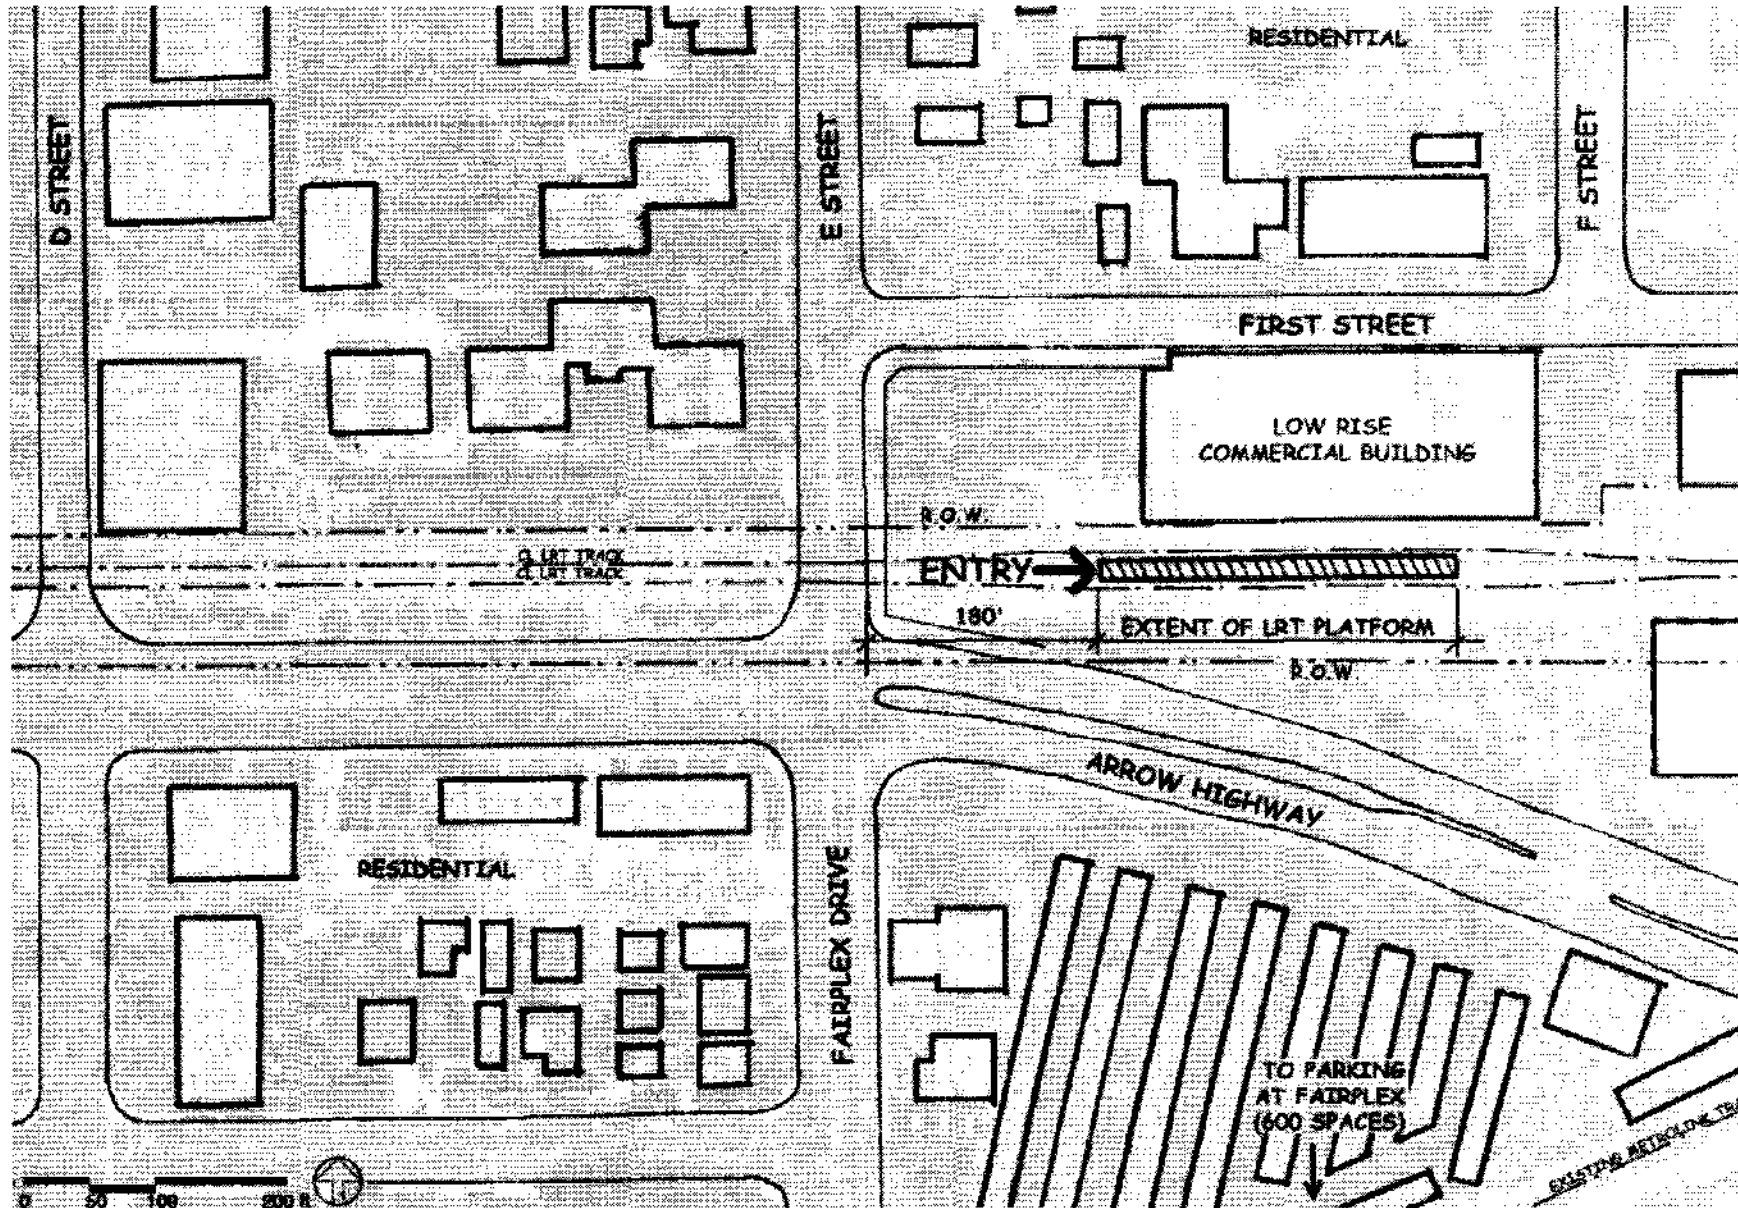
Site Plan: City of La Verne, E Street Station Option C
